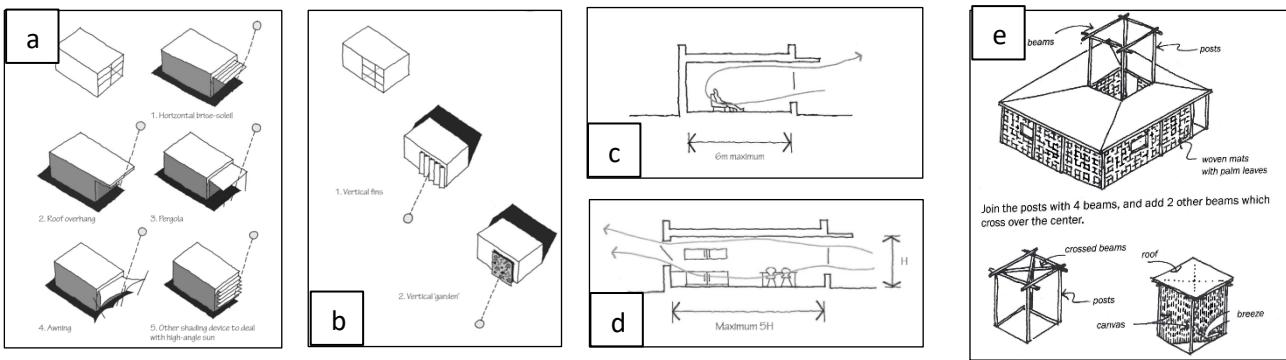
(a). Different type of shading: brise soleil, overhang, pergola and awning (Heywood, 2021,p.61); (b). vertical fins or gardens on West and East sides (Heywood, 2021,p.63); (c). Single-side ventilation (Heywood, 2021,p.137); (d). Cross ventilation (Heywood, 2021,p.139); (e). Illustration of modification of a roof to cool the space (Lengen, 2008, p.229).
